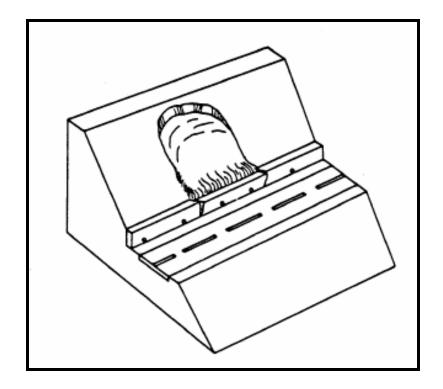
Impact on retaining structure (tilted on retaining wall) (FHWA, 1988)
